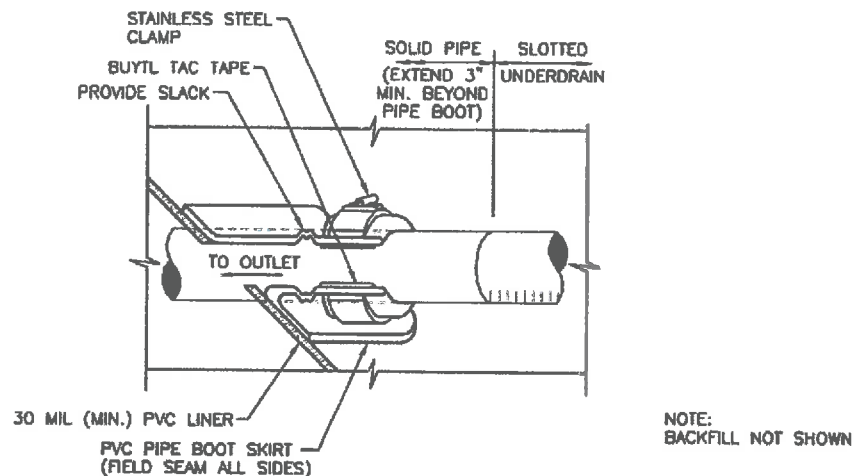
Geomembrane Liner/Underdrain Penetration Detail
